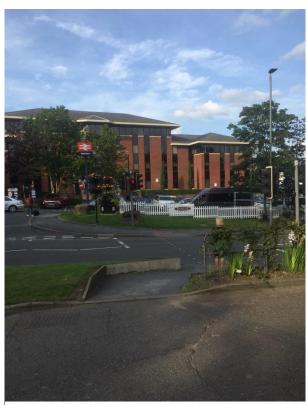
Crossing point and access between Broadway and Wilmslow rail station to be improved with Toucan crossing
